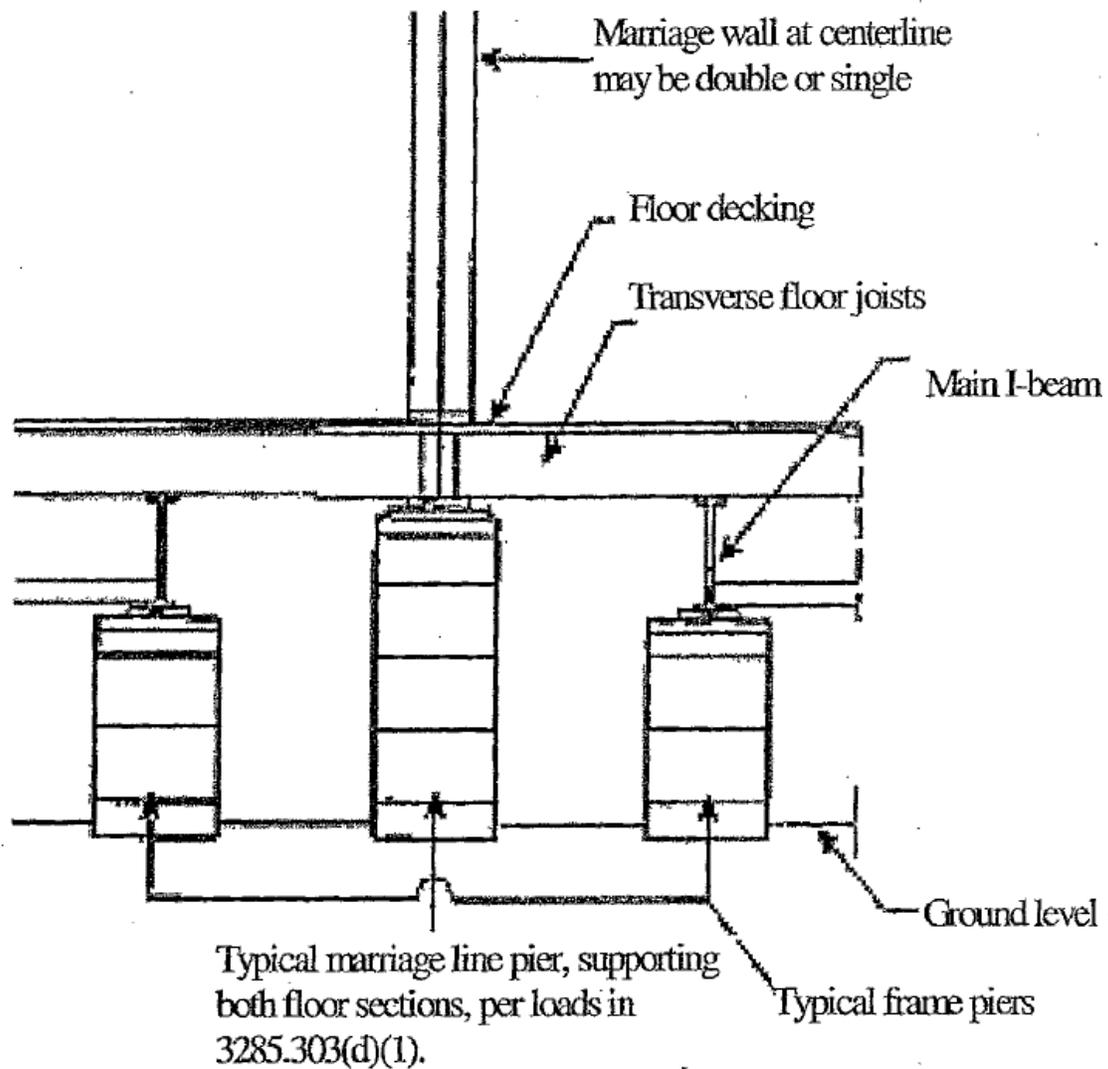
(b) Typical Mate-Line Column Pier and Mating Wall Support When Perimeter Blocking is Required.
